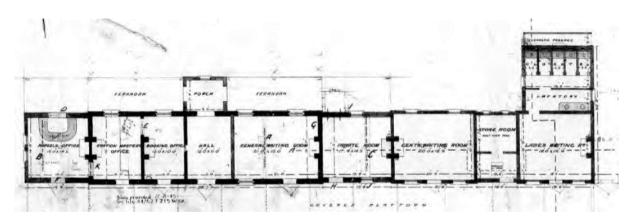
1889, alterations and additions to Platform building (Building A) (OCP Architects, 2020a:20)
